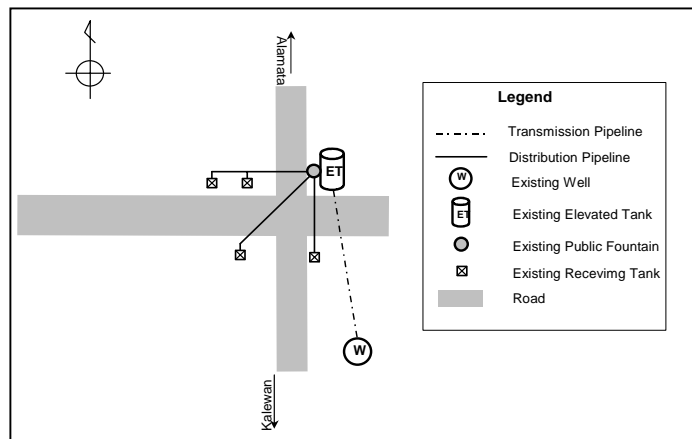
Layout of Existing Facilities of Gubi Dowra
